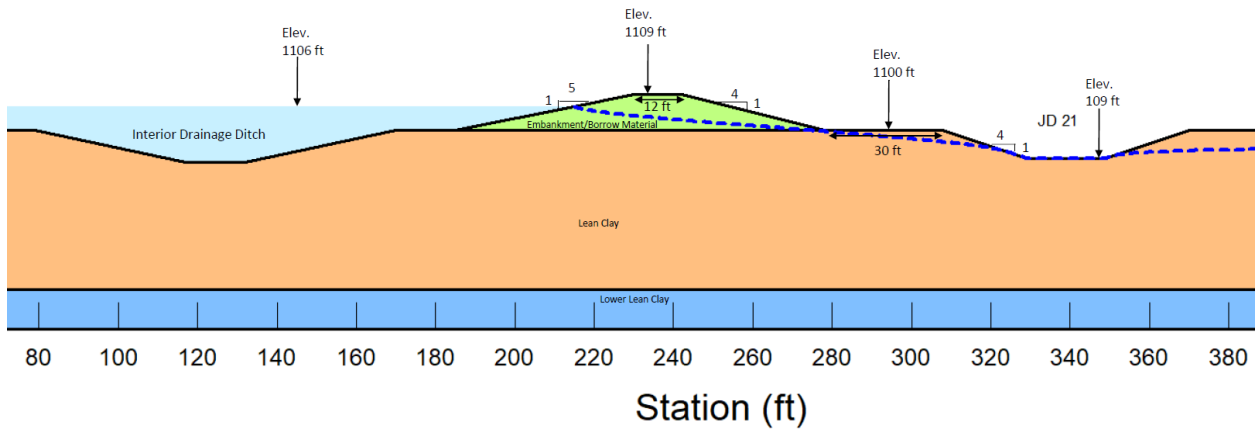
Cross Section at BH-8 with Exterior Drainage Ditch
